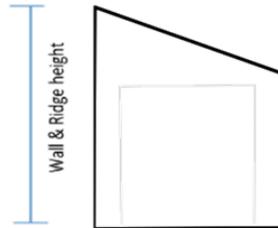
5 : Measuring wall and ridge height of an Outbuilding and/or Non-habitable buildings.
